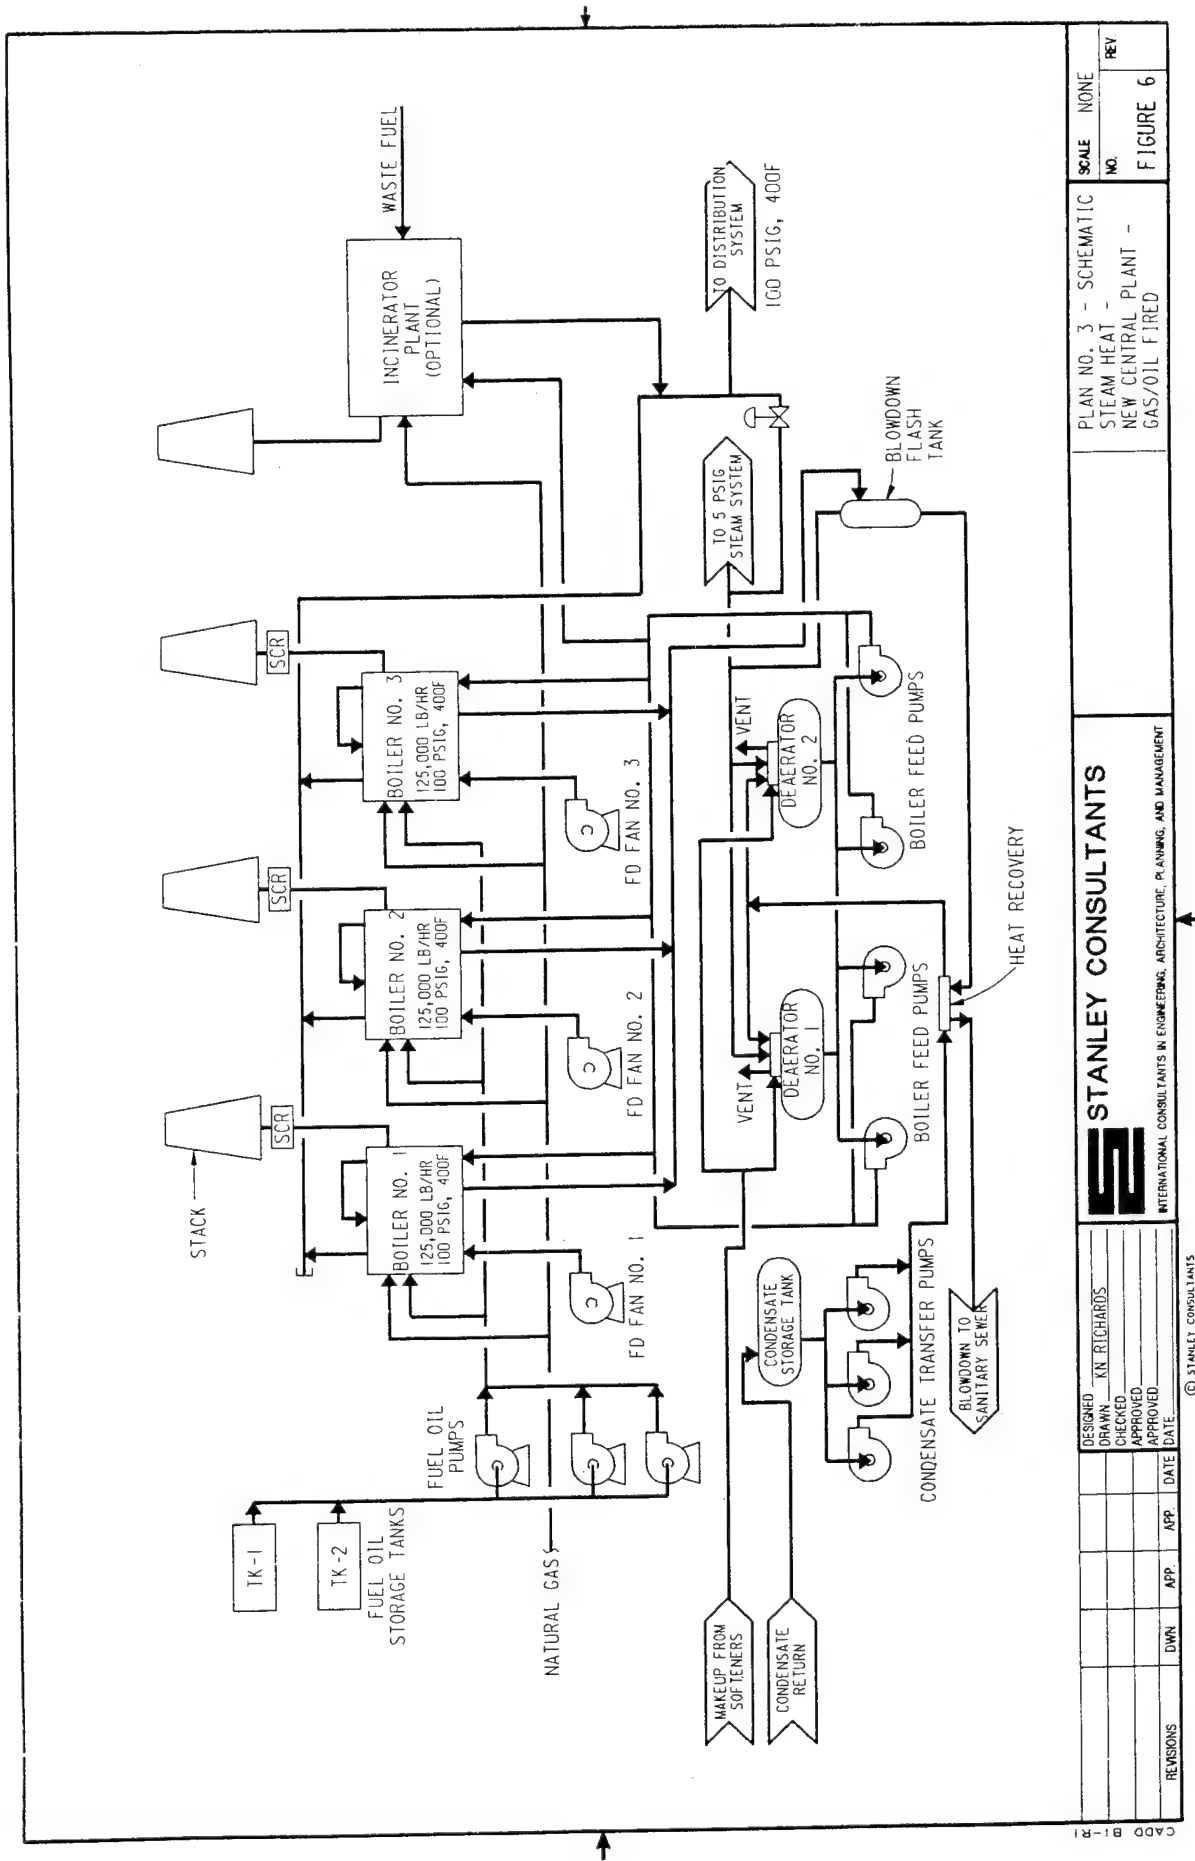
Schematic of Steam Heat—New Central Plant—Gas/Oil Fired.
